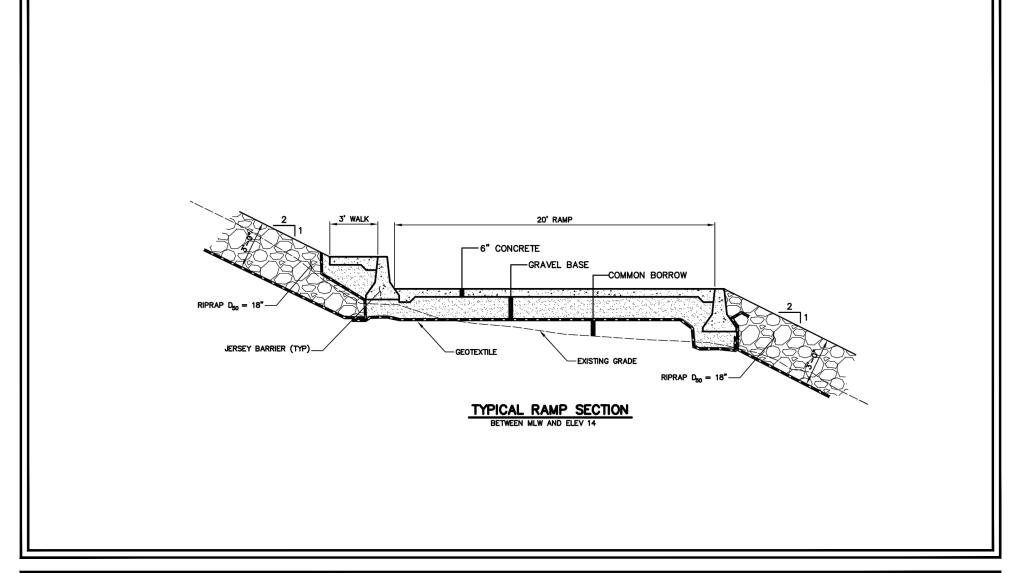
FIGURE:	BOOK: PAG 30887 2 32239 148	E: LOCATION: CITY OF PORTLAND CANAL LANDING	PROPOSED ACTIVITY: BOAT RAMP EXTENDING BEYOND MEAN LOW WATER ELEVATION AND FLOATING DOCKS	PROJECT APPLICANT: CANAL LANDING LLC 400 WEST COMMERCIAL STREET PORTLAND, ME 04101
